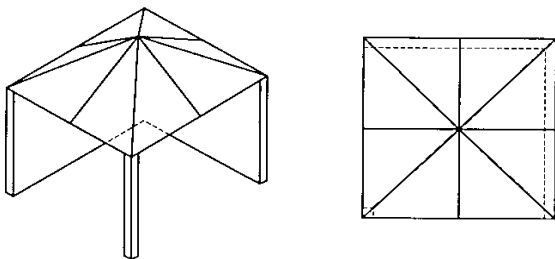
OUTDOOR AREA – EXAMPLE 3
